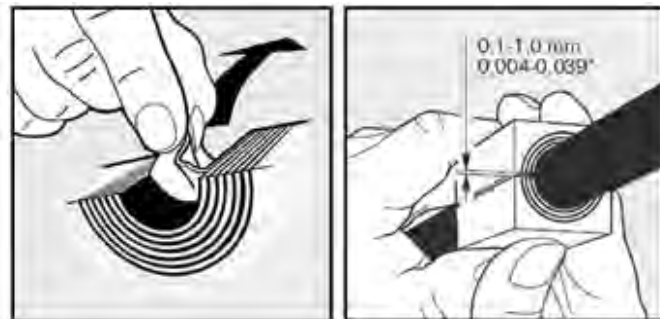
Adapting a Module to the Cable Size, Checking the Gap
